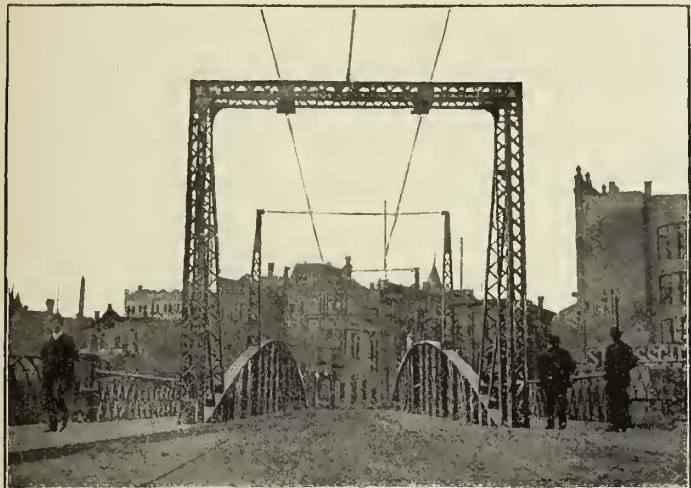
SWING BRIDGE—MILWAUKEE STREET RAILWAY SYSTEM.
